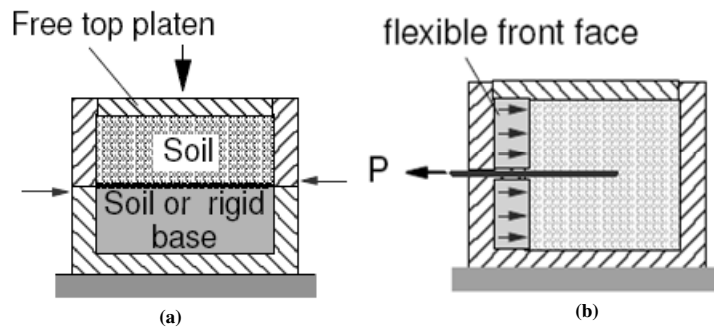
Soil-geosynthetic interface test (a) Modified direct shear test (b) Pullout test (adapted from Palmeria, 2008)
